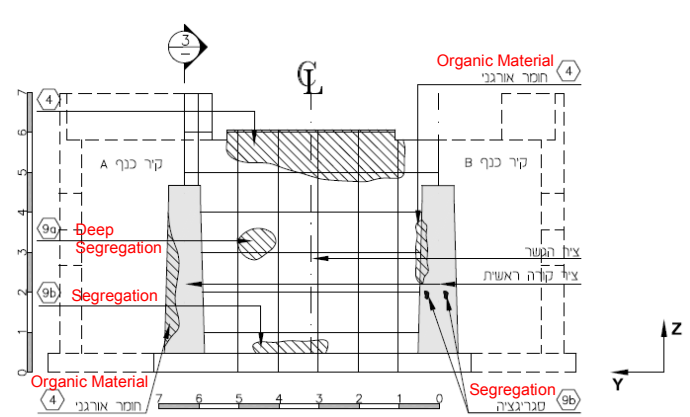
Elevation of Abutment 11 with defects marking
